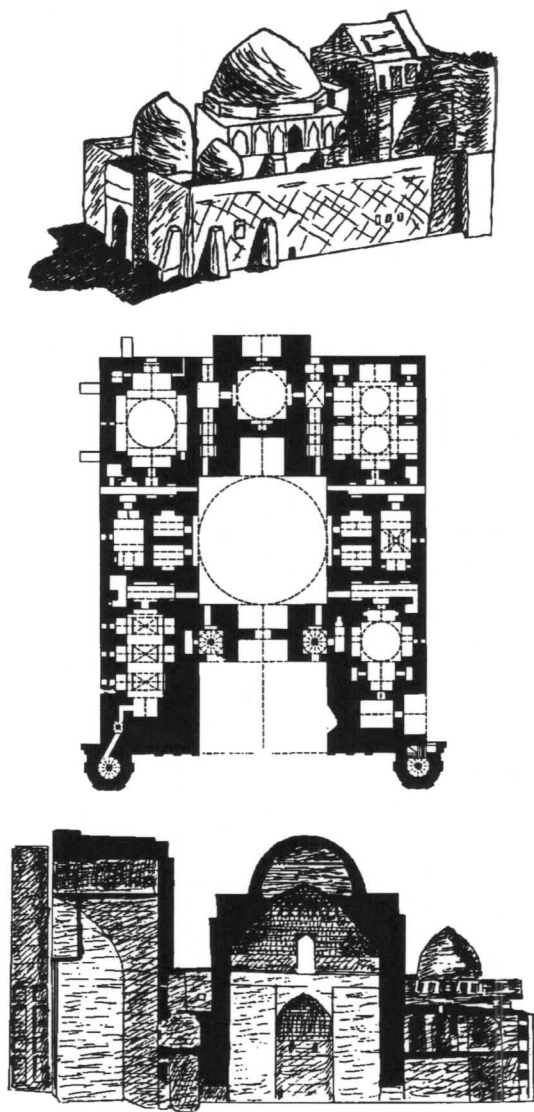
General view, plan and section view of the Akhmed Yasavi mausoleum
